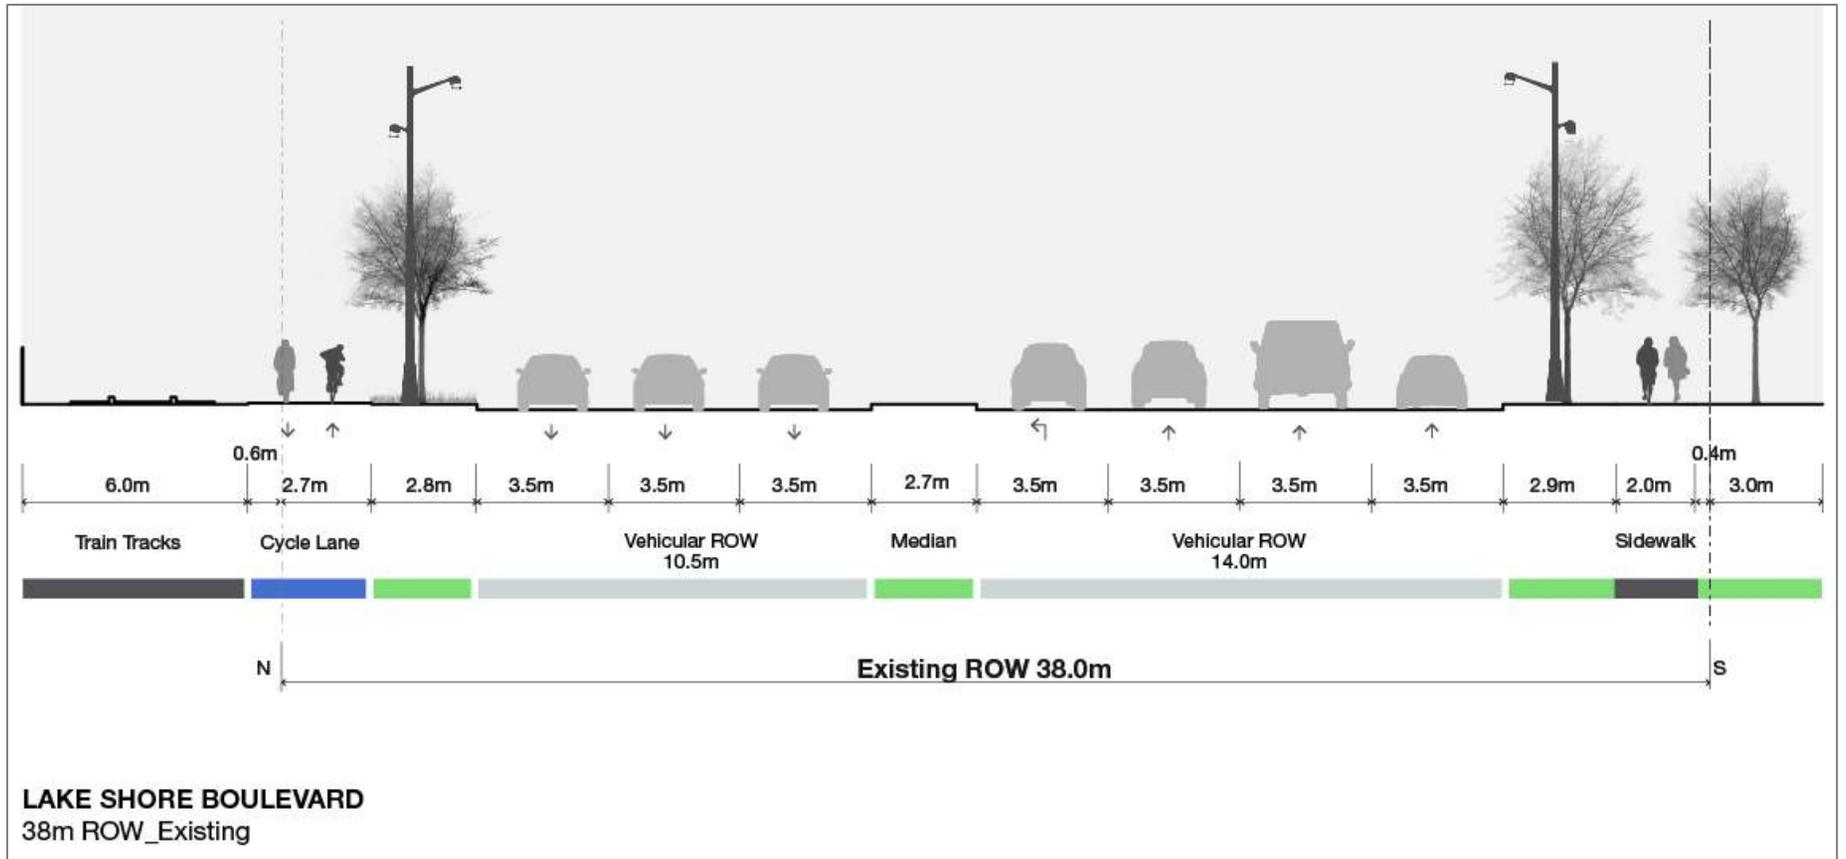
CROSS-SECTION – EXISTING LAKE SHORE BOULEVARD WEST
